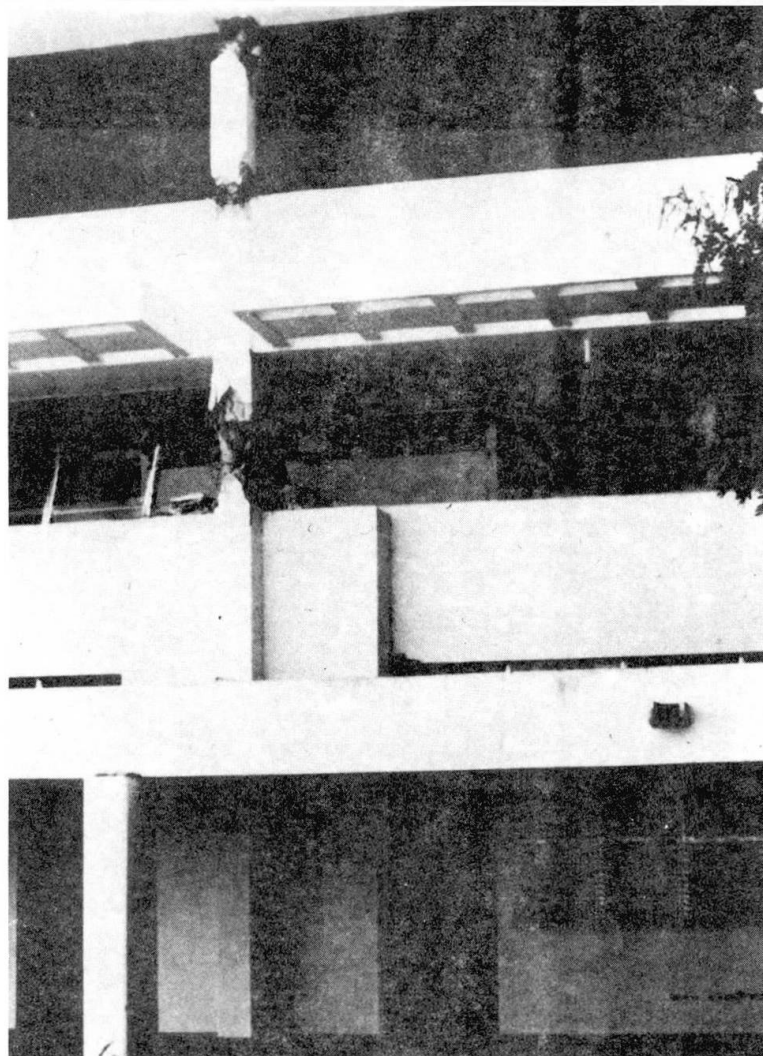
Colegio Teresiano in Managua, Nicaragua, after 1972 earthquake. First story stiffening wall, which can be seen projecting outward from second floor beam, prevented first story damage but increased upper story damage.
